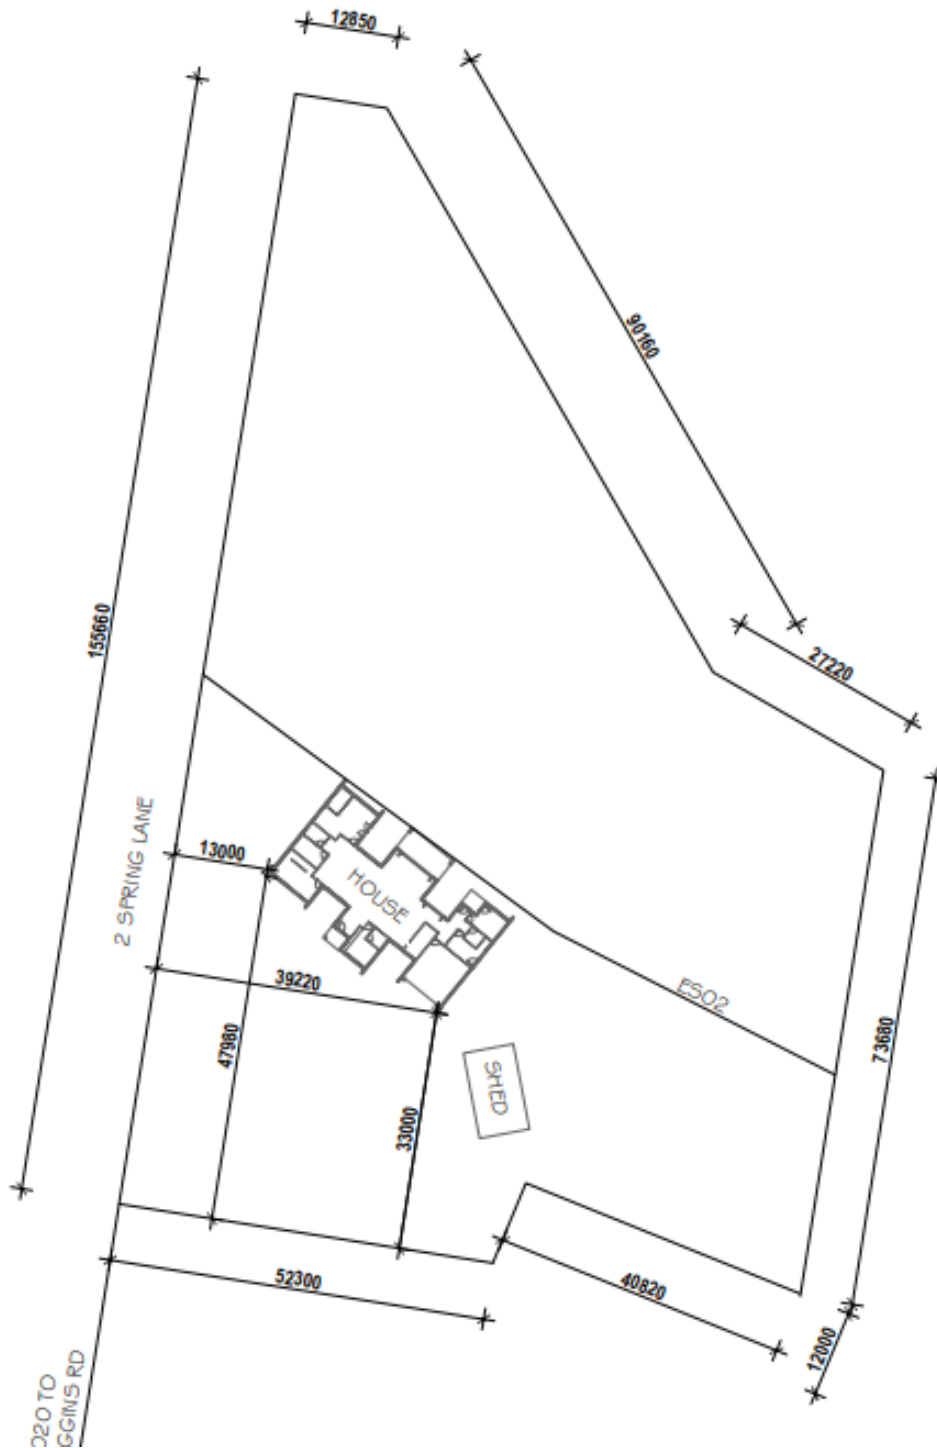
Site plan of proposed dwelling and ancillary outbuilding
